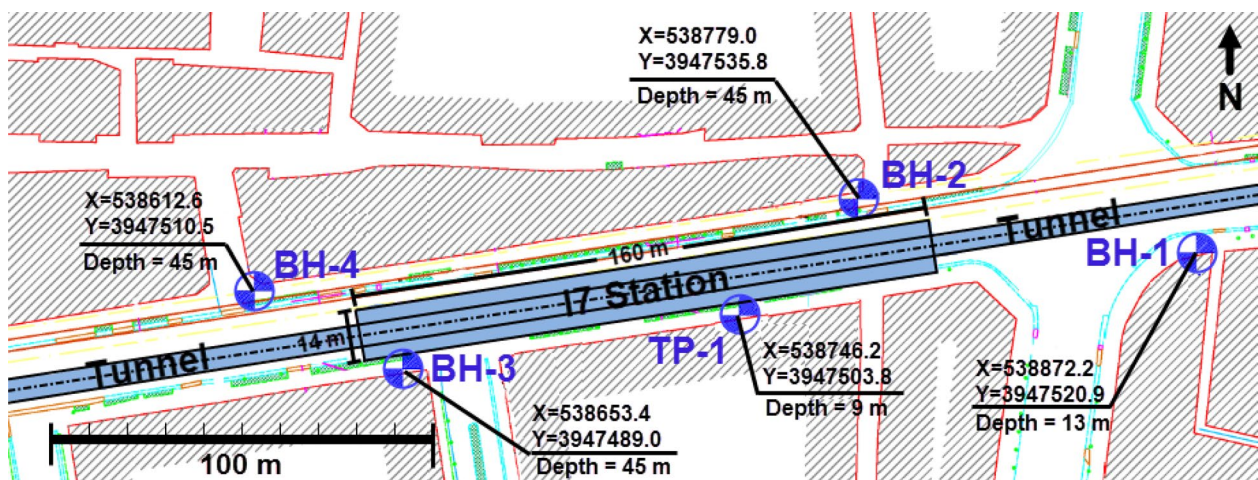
Boreholes and test-pit location relative to Molavi Station (I7 Station) location on the site plan [28]
